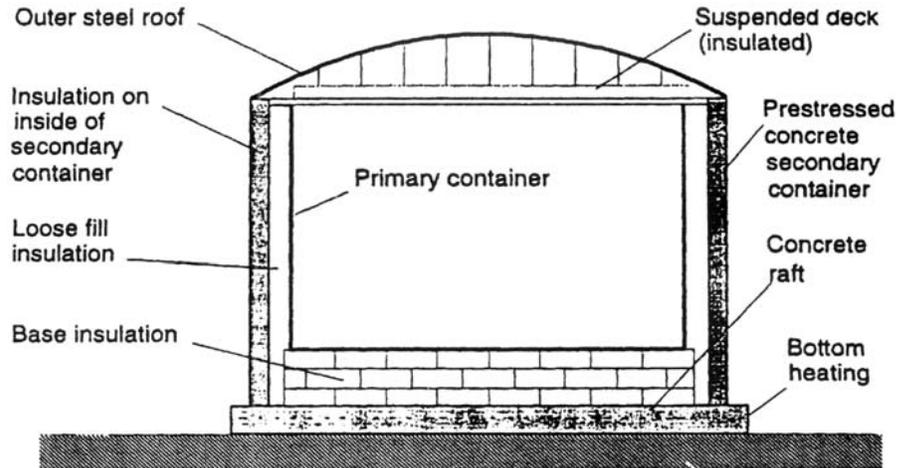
The primary and secondary containment tanks for a "full containment" storage tank of the type to be used at the proposed Harpswell LNG terminal.
